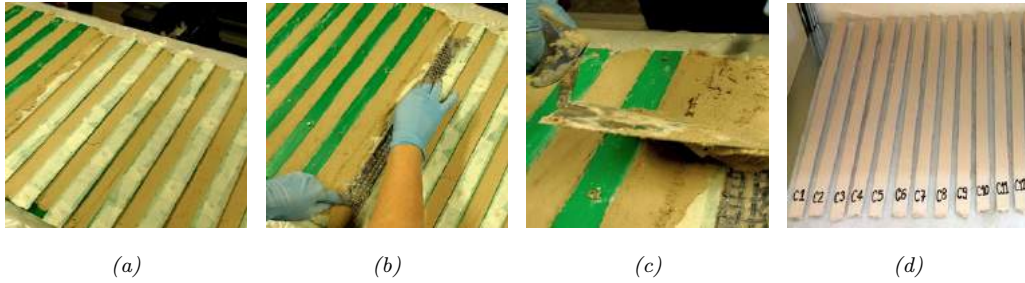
Specimen manufacturing: (a) impregnated reinforcement placing (b) formwork upper piece and mortar second layer (c) coupons (d) coupons with tabs
